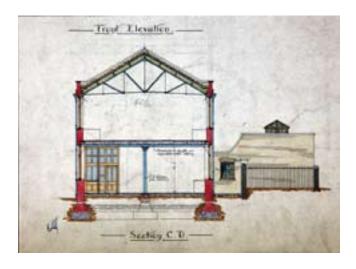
Sectional drawing of the Bindery, 1897. Copyright TNA (detail of WORK 33/1990)
